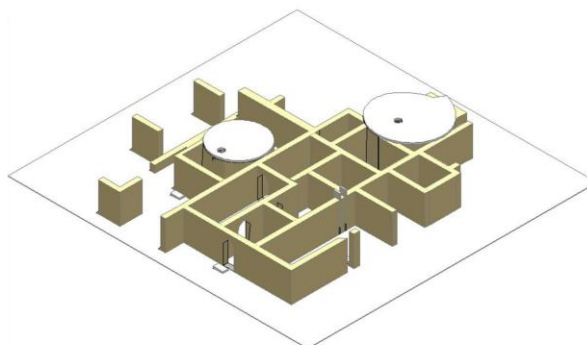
Showing the hypothetical reconstruction of the Dholavira Bailey structure with 2.5m high walls.
